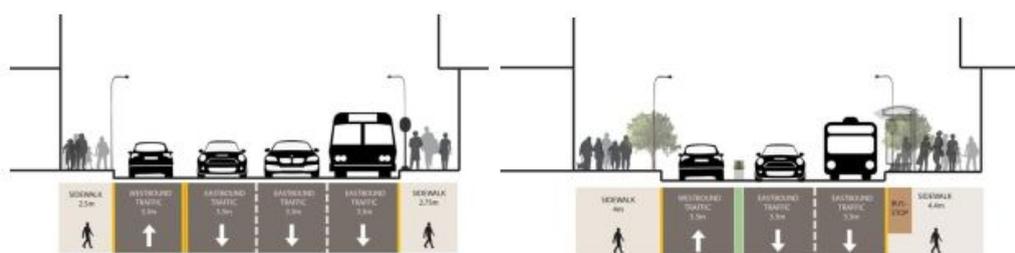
Section of Sidewalk Widening at Wuhu Street in Green Corridor 5
